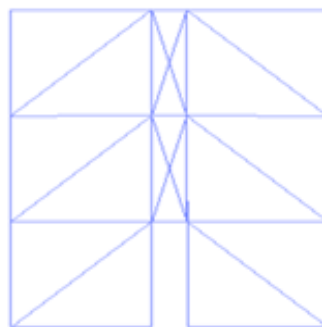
Three Floor Steel-Braced Frame with low damage system modeled in OpenSEES [3].
